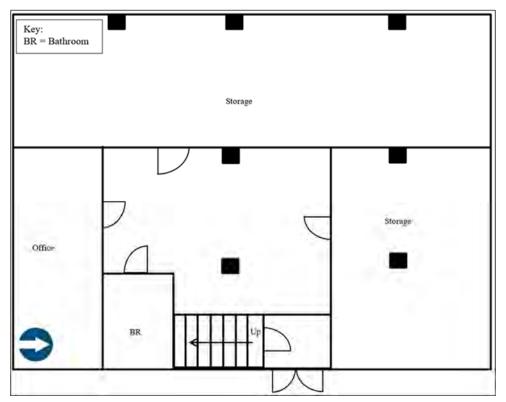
BASEMENT PLAN (NOT TO SCALE)
